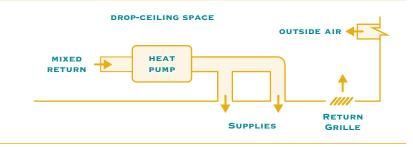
CEILING SPACE USED AS RETURN AIR PLENUM
